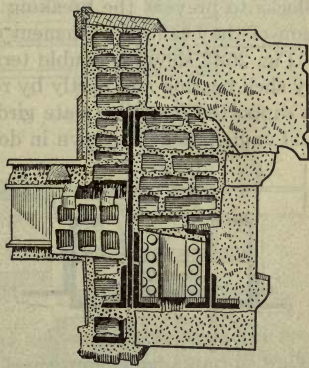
Spandrel Section, 4th Floor, Broadway Chambers, N. Y.
